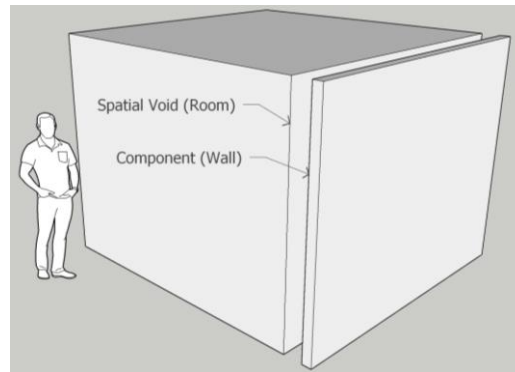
Component-oriented (wall) and Space-oriented (room) building modules where every surface of each module is an interface.
